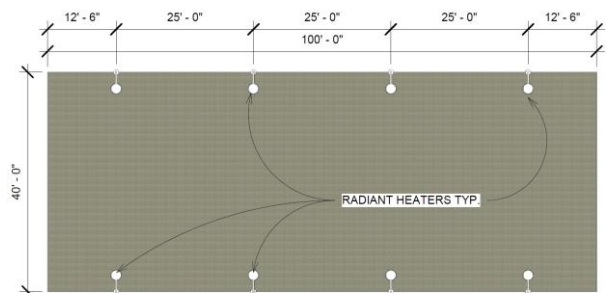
Floor plan of a concrete slab with radiant heaters.
